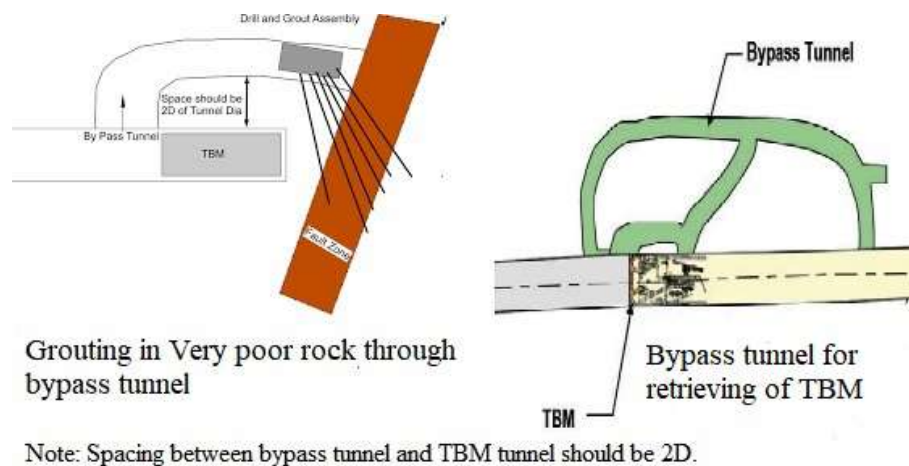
Bypass tunnel for retrieving of TBM and grouting in poor rock
